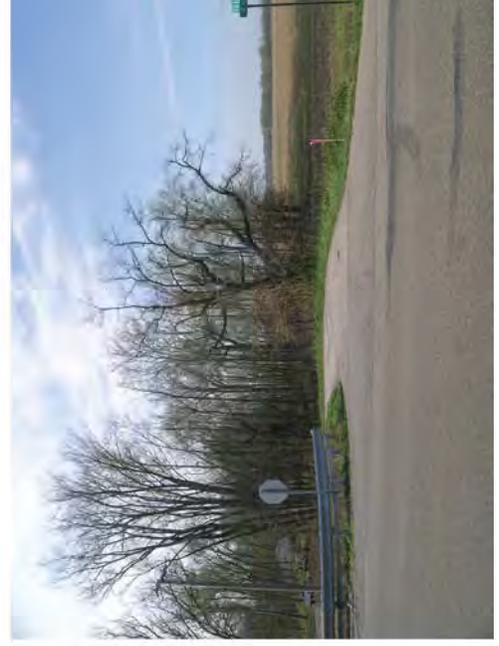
Looking south at the SR 46/CR 475 E intersection.
